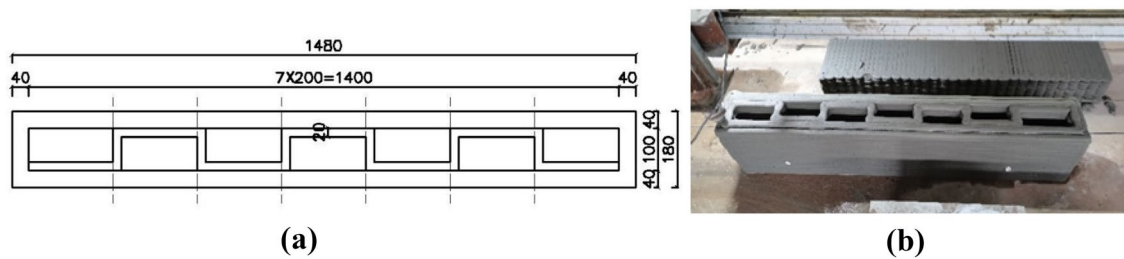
Hollow wall diagram. a Schematic diagram of cross-section of hollow wall (mm). b Hollow wall physical drawing (mm)
